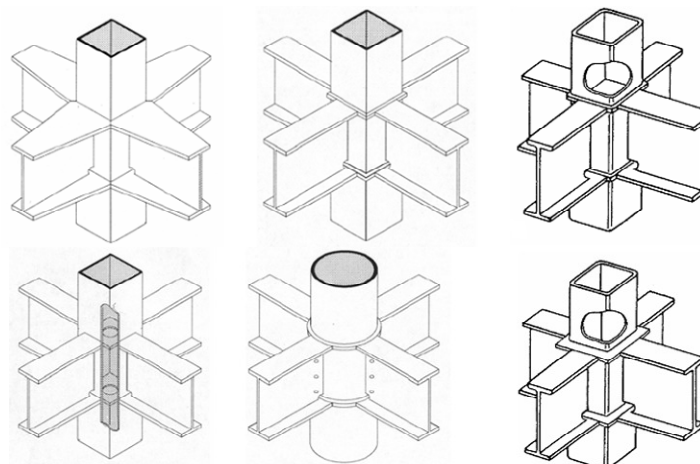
Existing connection solutions for welded beam-to-column joints
